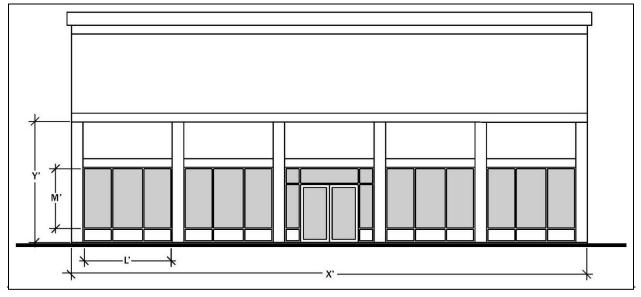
F.1.a Ground-Floor Windows and Doors
